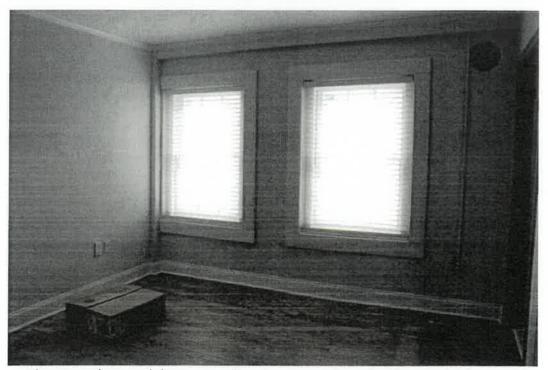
Plaster and sheet rock walls, restored windows, third floor, looking southwest
